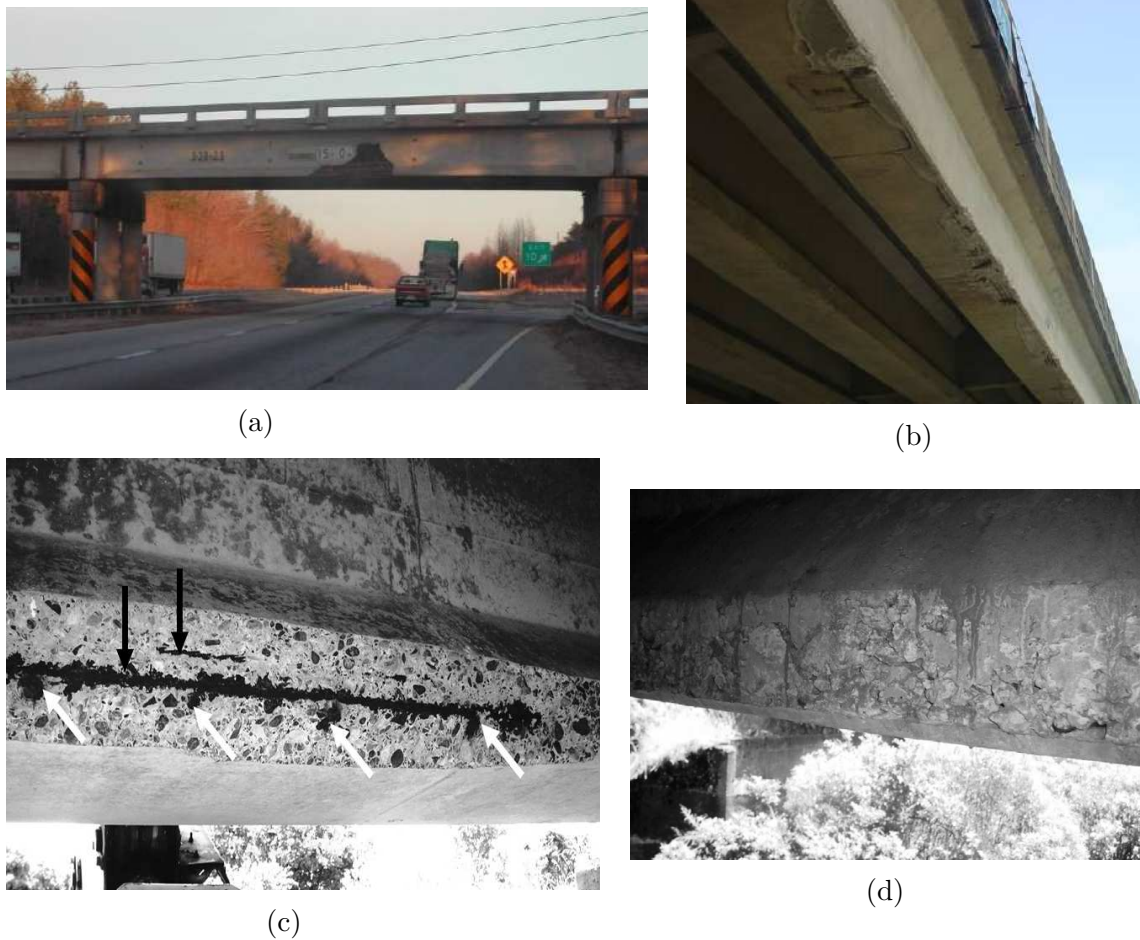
Several types of damage in PC girders: (a) loss of section due to vehicle impact in the middle span, (b) concrete spalling, (c) spalling over prestressing strand and corrosion; and (d) poor compaction of concrete (Bruce et al., 2008; Harries et al., 2009).
